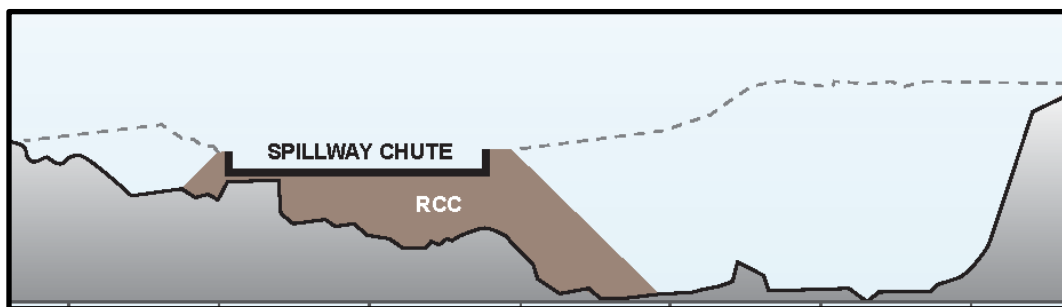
Conceptual cross section for reconstructing the eroded the FCO Spillway lower chute using Roller Compacted Concrete in 2017
